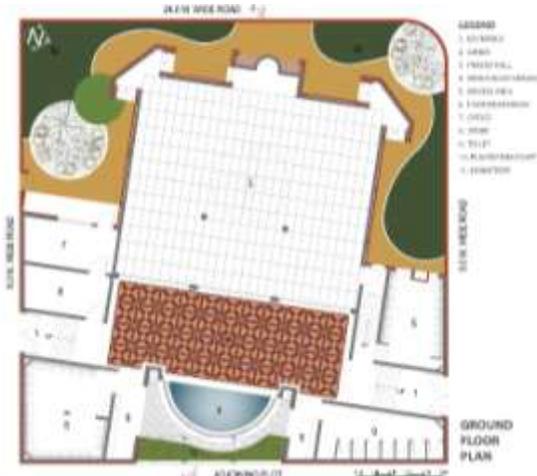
Ground floor plan, Source: (NBZ Malegaon mosque, n.d.)
